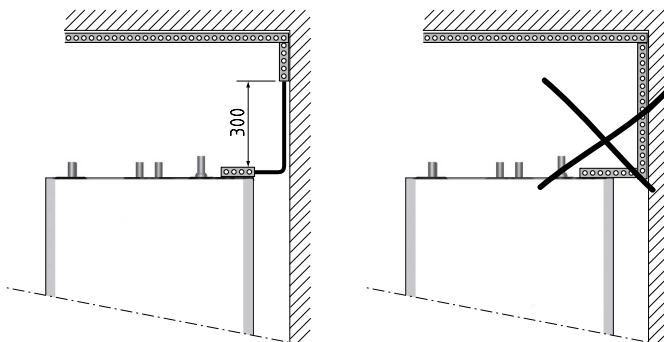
Recommended distance between trunking on the wall and trunking on the heat pump is 300 mm
